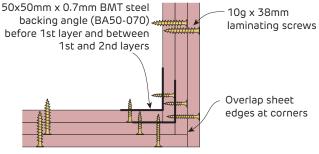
Laminated Vertical Shaft External Corner Plan view
